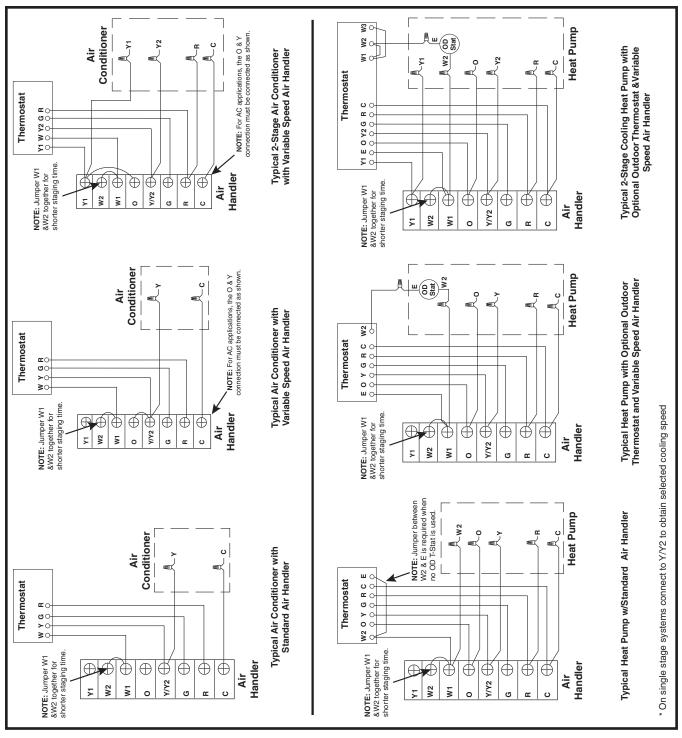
Typical Air Conditioner & Heat Pump System Connections
